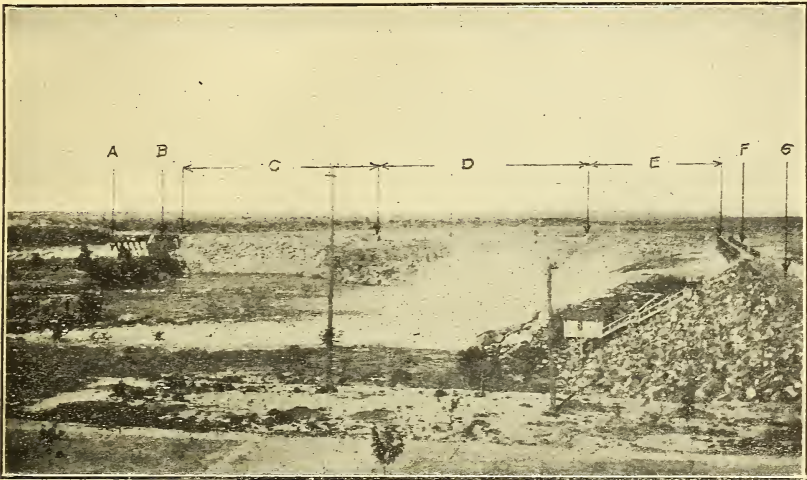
General view of Milner Dam, Snake River, Idaho: A, Control or wastegates on canal; B, Headgates, North Side Canal; C, North dam, length 340 feet on top; D, Spillway, concrete apron; E, Middle dam, length 335 feet on top; F, Regulating gates (99); G, South dam, length 560 feet on top. Total length of structure 2,100 feet.
